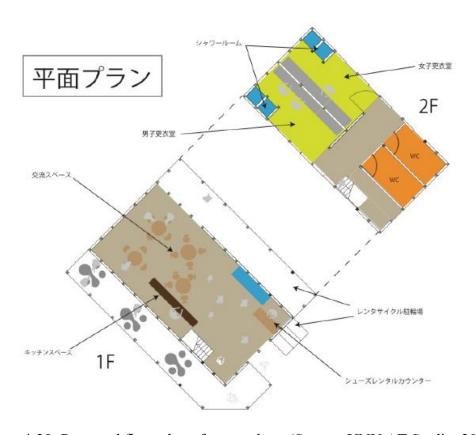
Proposed floor plan of sports shop. (Source: YNU AT Studio, 2018)
